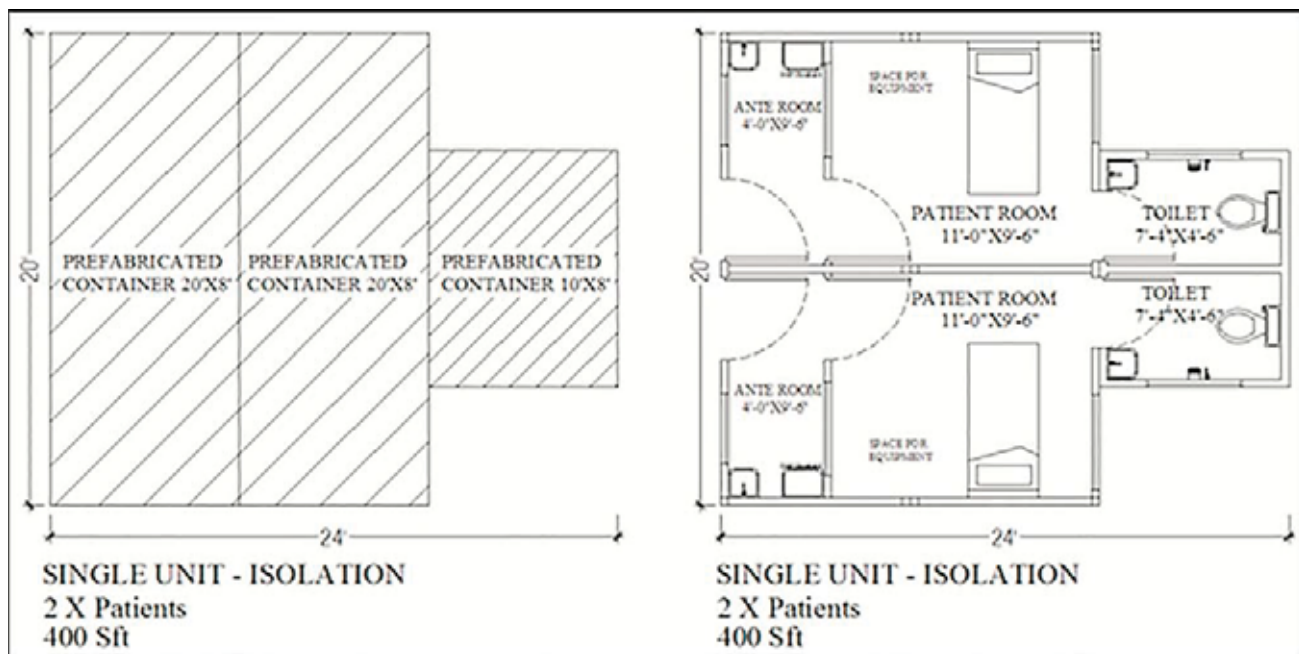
Multiple Shipping Containers used and Architectural Plan for Single Unit Isolation Room for Two Patients.
